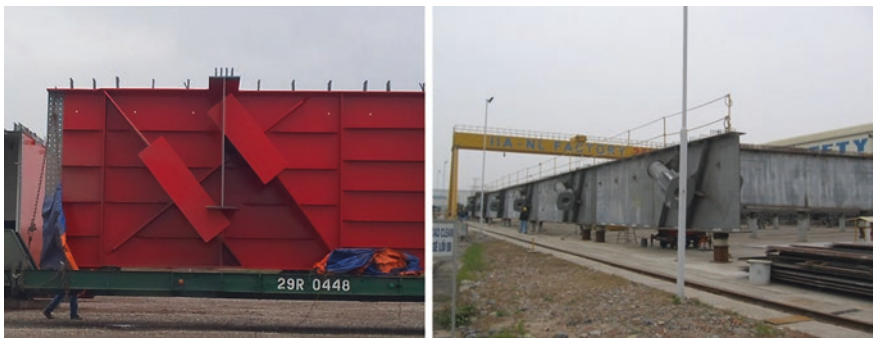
Fabrication of steel girder and trial assembling on IIA
